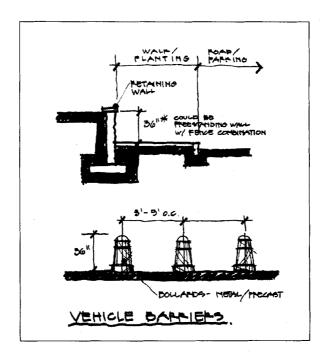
f outlines various methods to provide the soft barrier at the secure perimeter. The various methods can be bollards, street furniture such as benches, light fixtures, trash receptacles, planters, and retaining walls or freestanding walls a minimum of 36 inches high. See the SDC for additional specifications regarding site security barriers, as well as for the architectural and engineering criteria.
